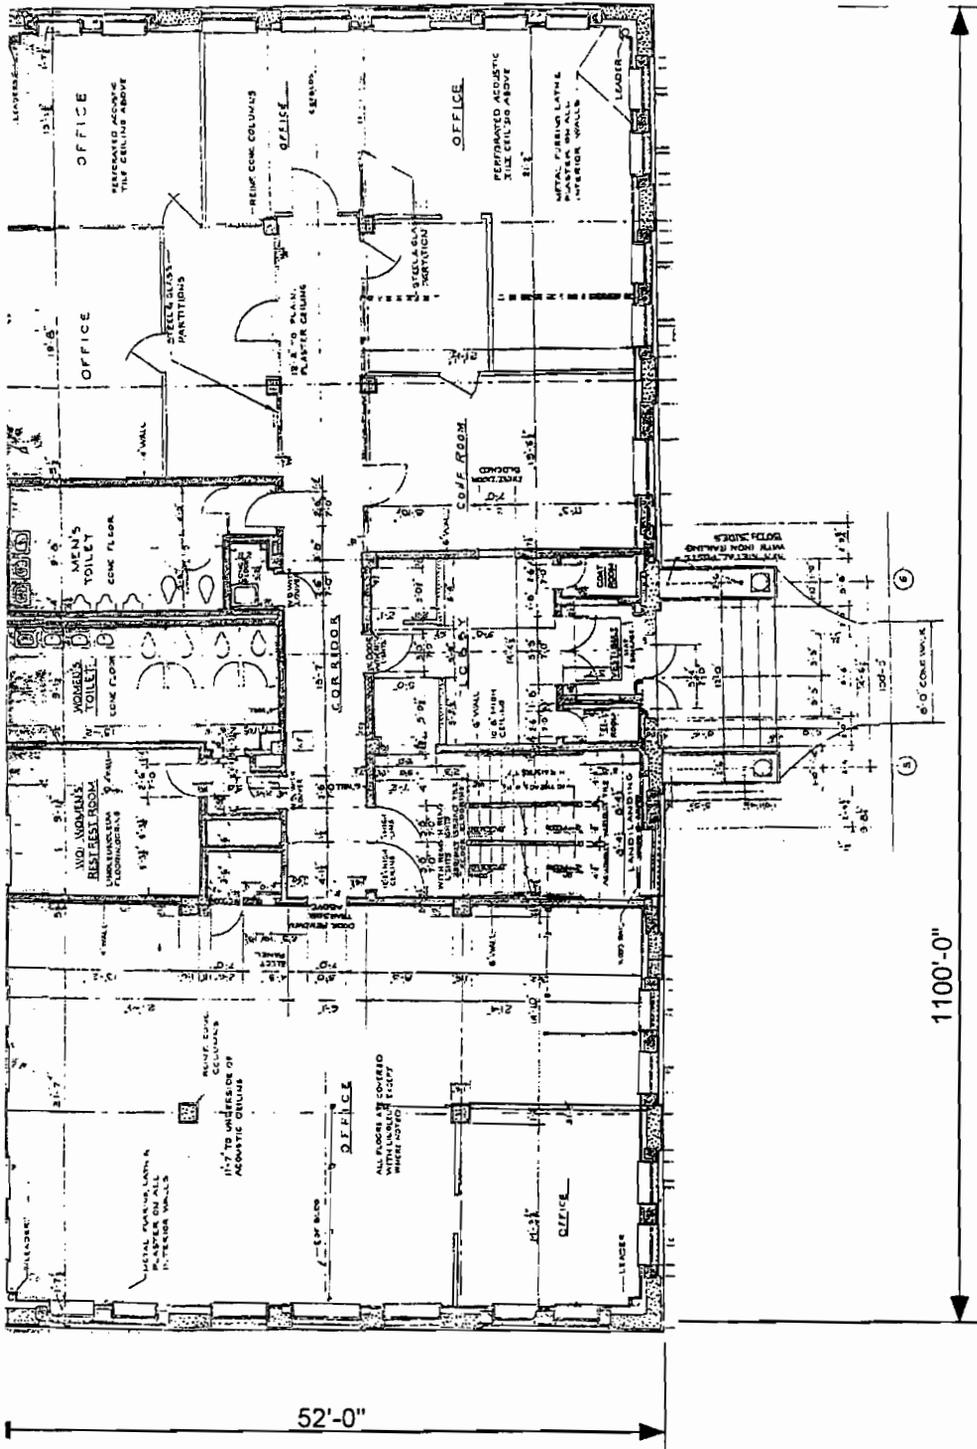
Building 172, Ordnance Administration Building, Blueprint # DP-57492, U.S. Army Munitions Command Office, First Floor Plan, June 30, 1941, Francisco and Jacobus, Architects and Engineers, New York and Chicago. Picatinny Arsenal, Morris County, New Jersey (on file in DPW, Picatinny Arsenal).
